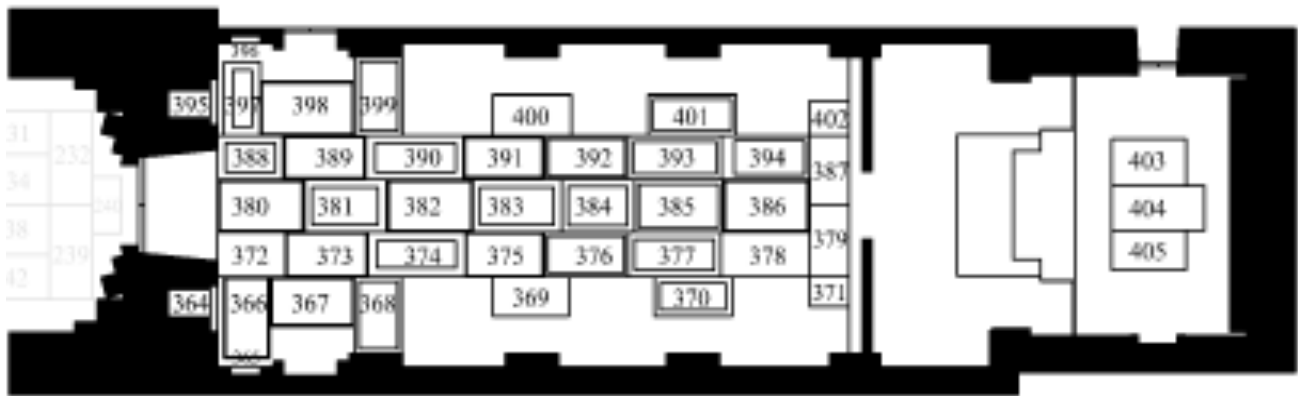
Floor plan of the Oratory at St John's, with sepulchral slabs and monuments according floor plan numbering.
